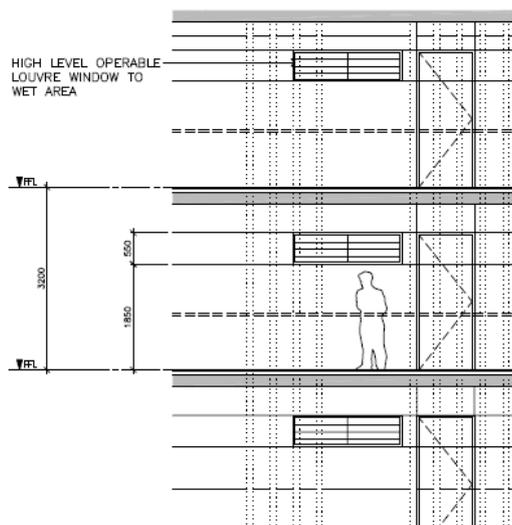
extract from submitted plan DA08 showing details for high level operable louvre windows that provide natural cross ventilation to apartments at the rear of the site via non-habitable rooms
